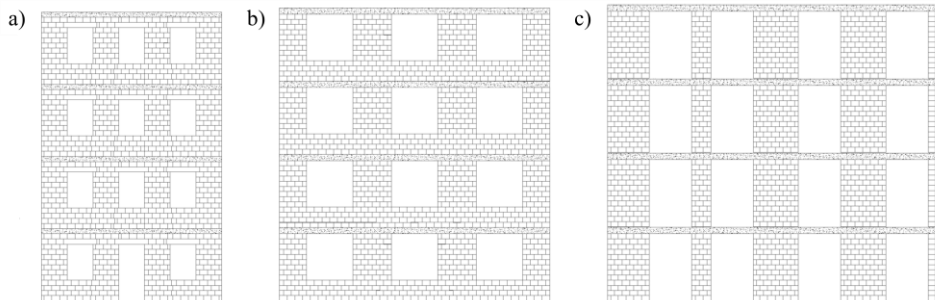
Typical masonry walls of modern URM buildings [35]
